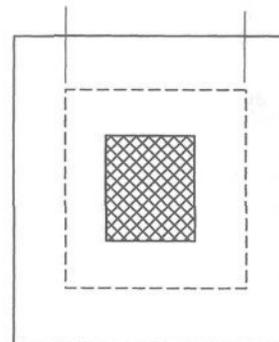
PUNCHING SHEAR PLAN VIEW
